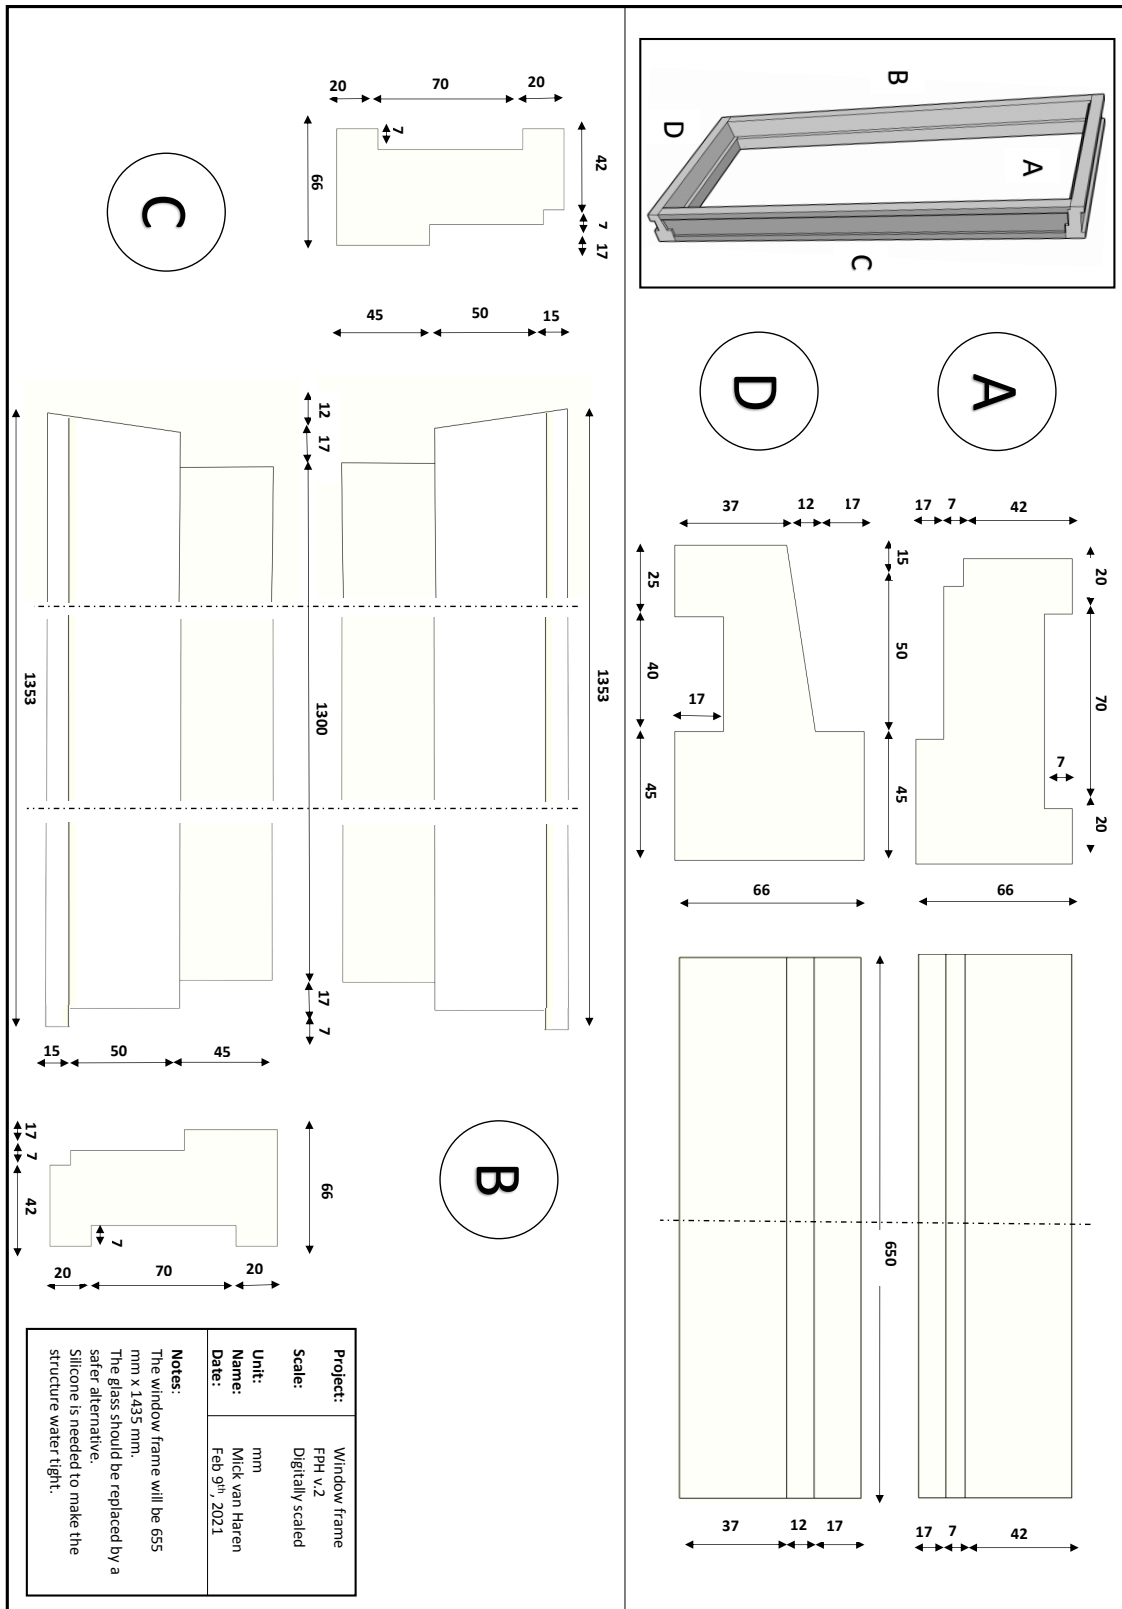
Blueprint illustration of the window frame placed in the cavity wall at the Flood Proof Holland Basin. The dimensions are noted in millimeters and the figures are scaled digitally.
